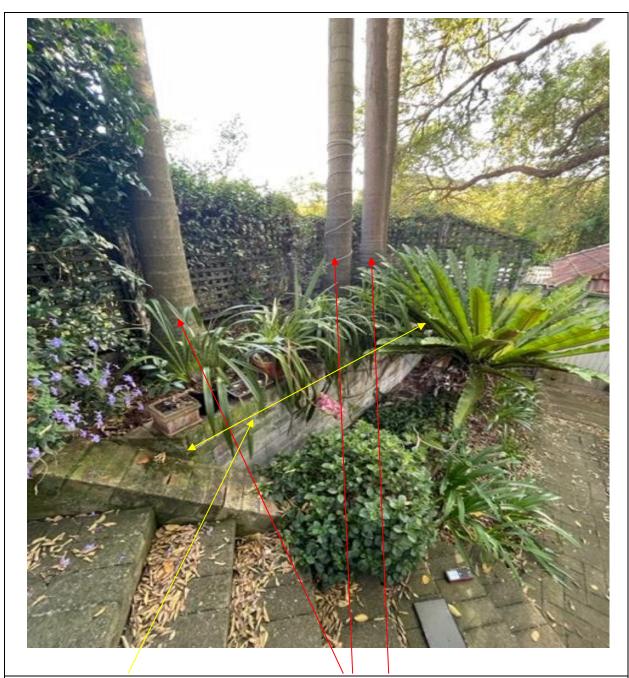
Photo A: The existing wall may be providing support for Trees 5,6 and 7 and is recommended to be retained and the area filled around. See section 7 and 8.2 for discussion.
